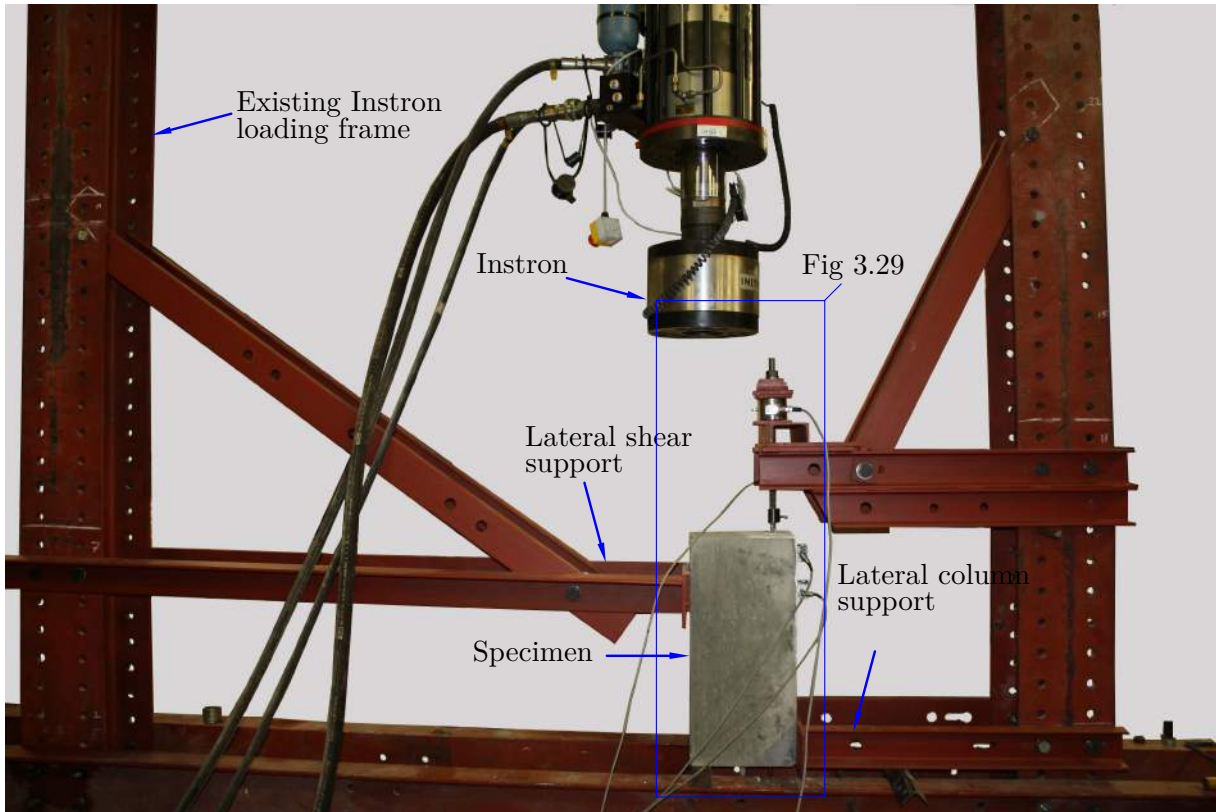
The manufactured beam-end test setup assembled into the Instron loading frame, with loaded BE specimen in place.
